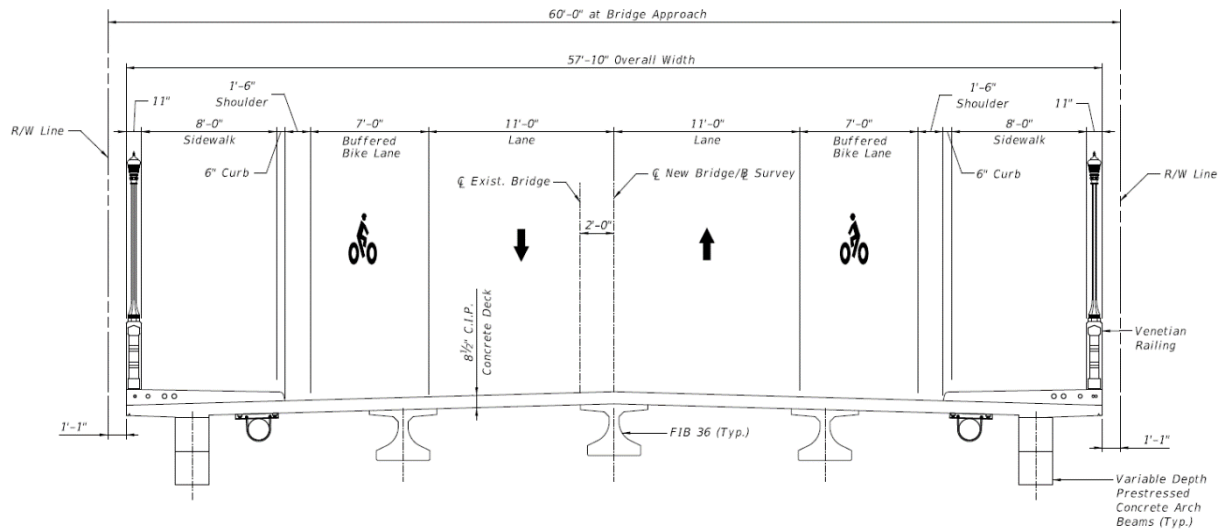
Replacement Alternative 8 - Bridge Typical Section
